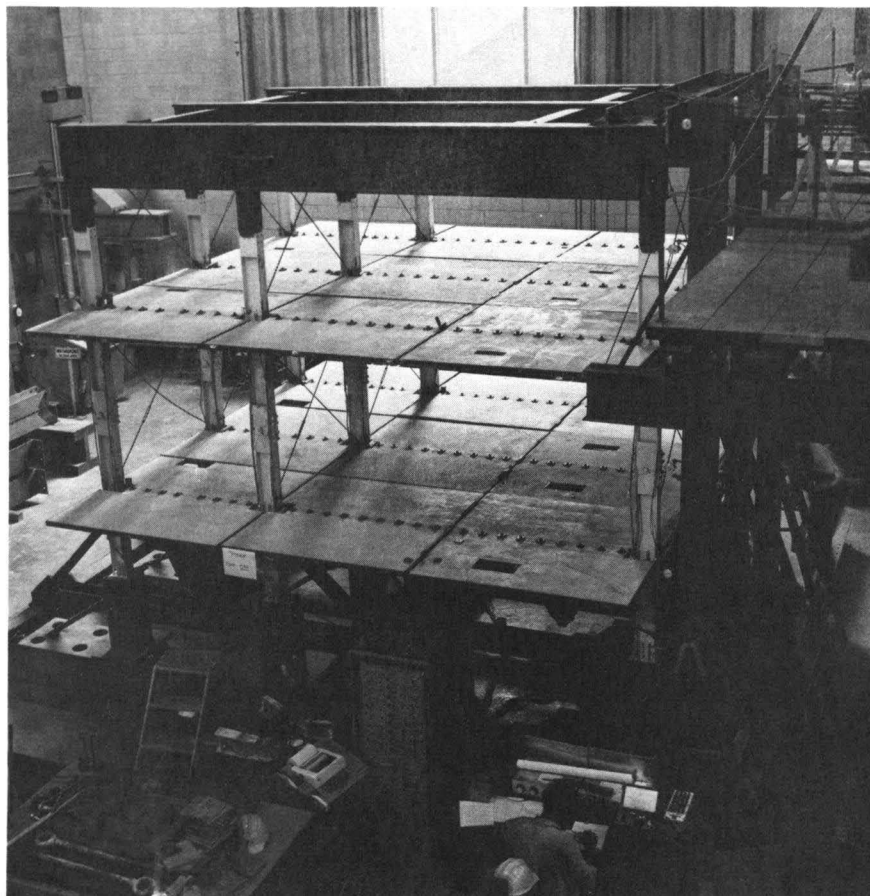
TEST BUILDING WITH CONCRETE FLOORS
